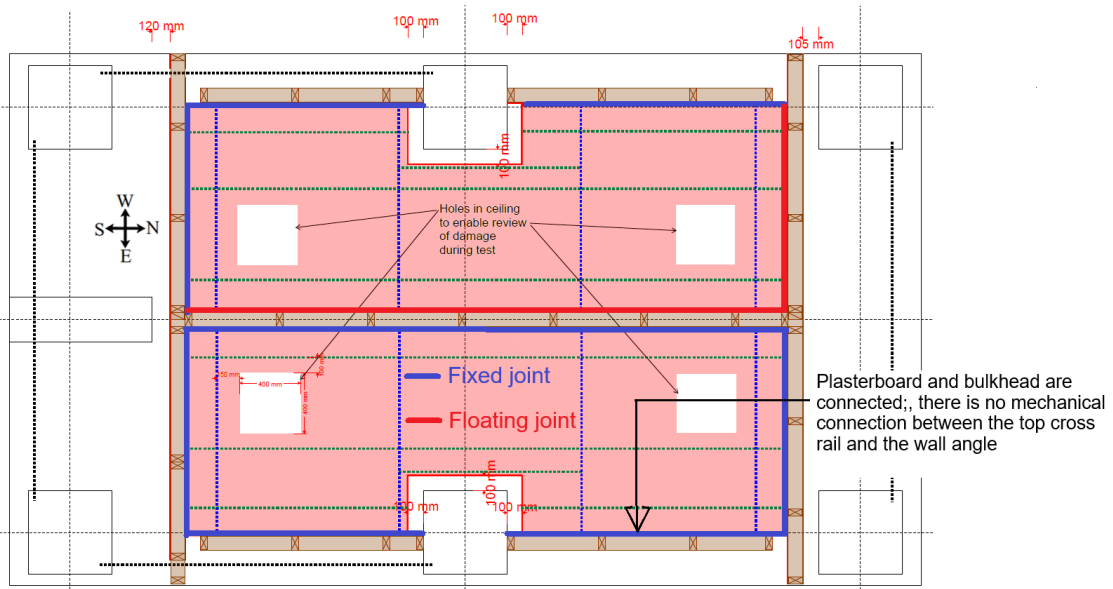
Area of ceiling installation with as-built perimeter joint details (plan)
